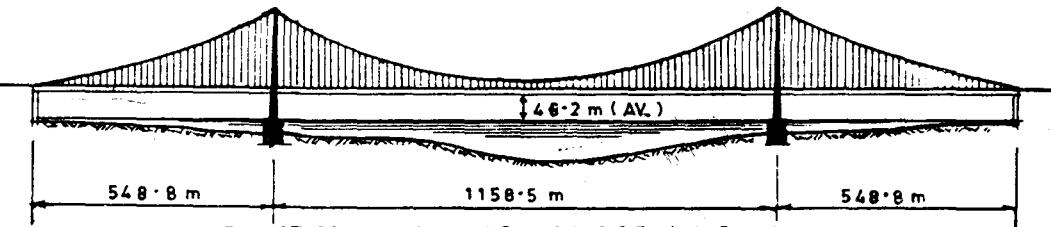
MACKINAC BRIDGE (U.S.A.)
